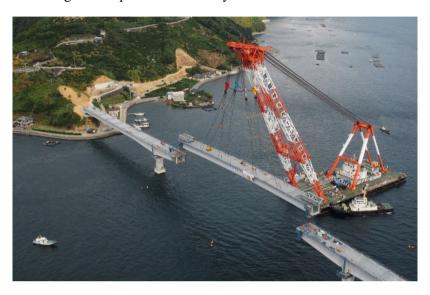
Example of large block erection of steel box girder bridge (Kushima Bridge)
